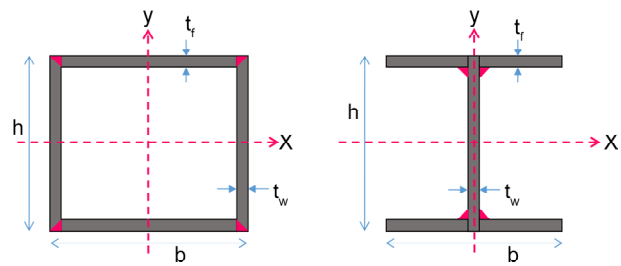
Cross-sections for beams, columns (right) and braces (left).
